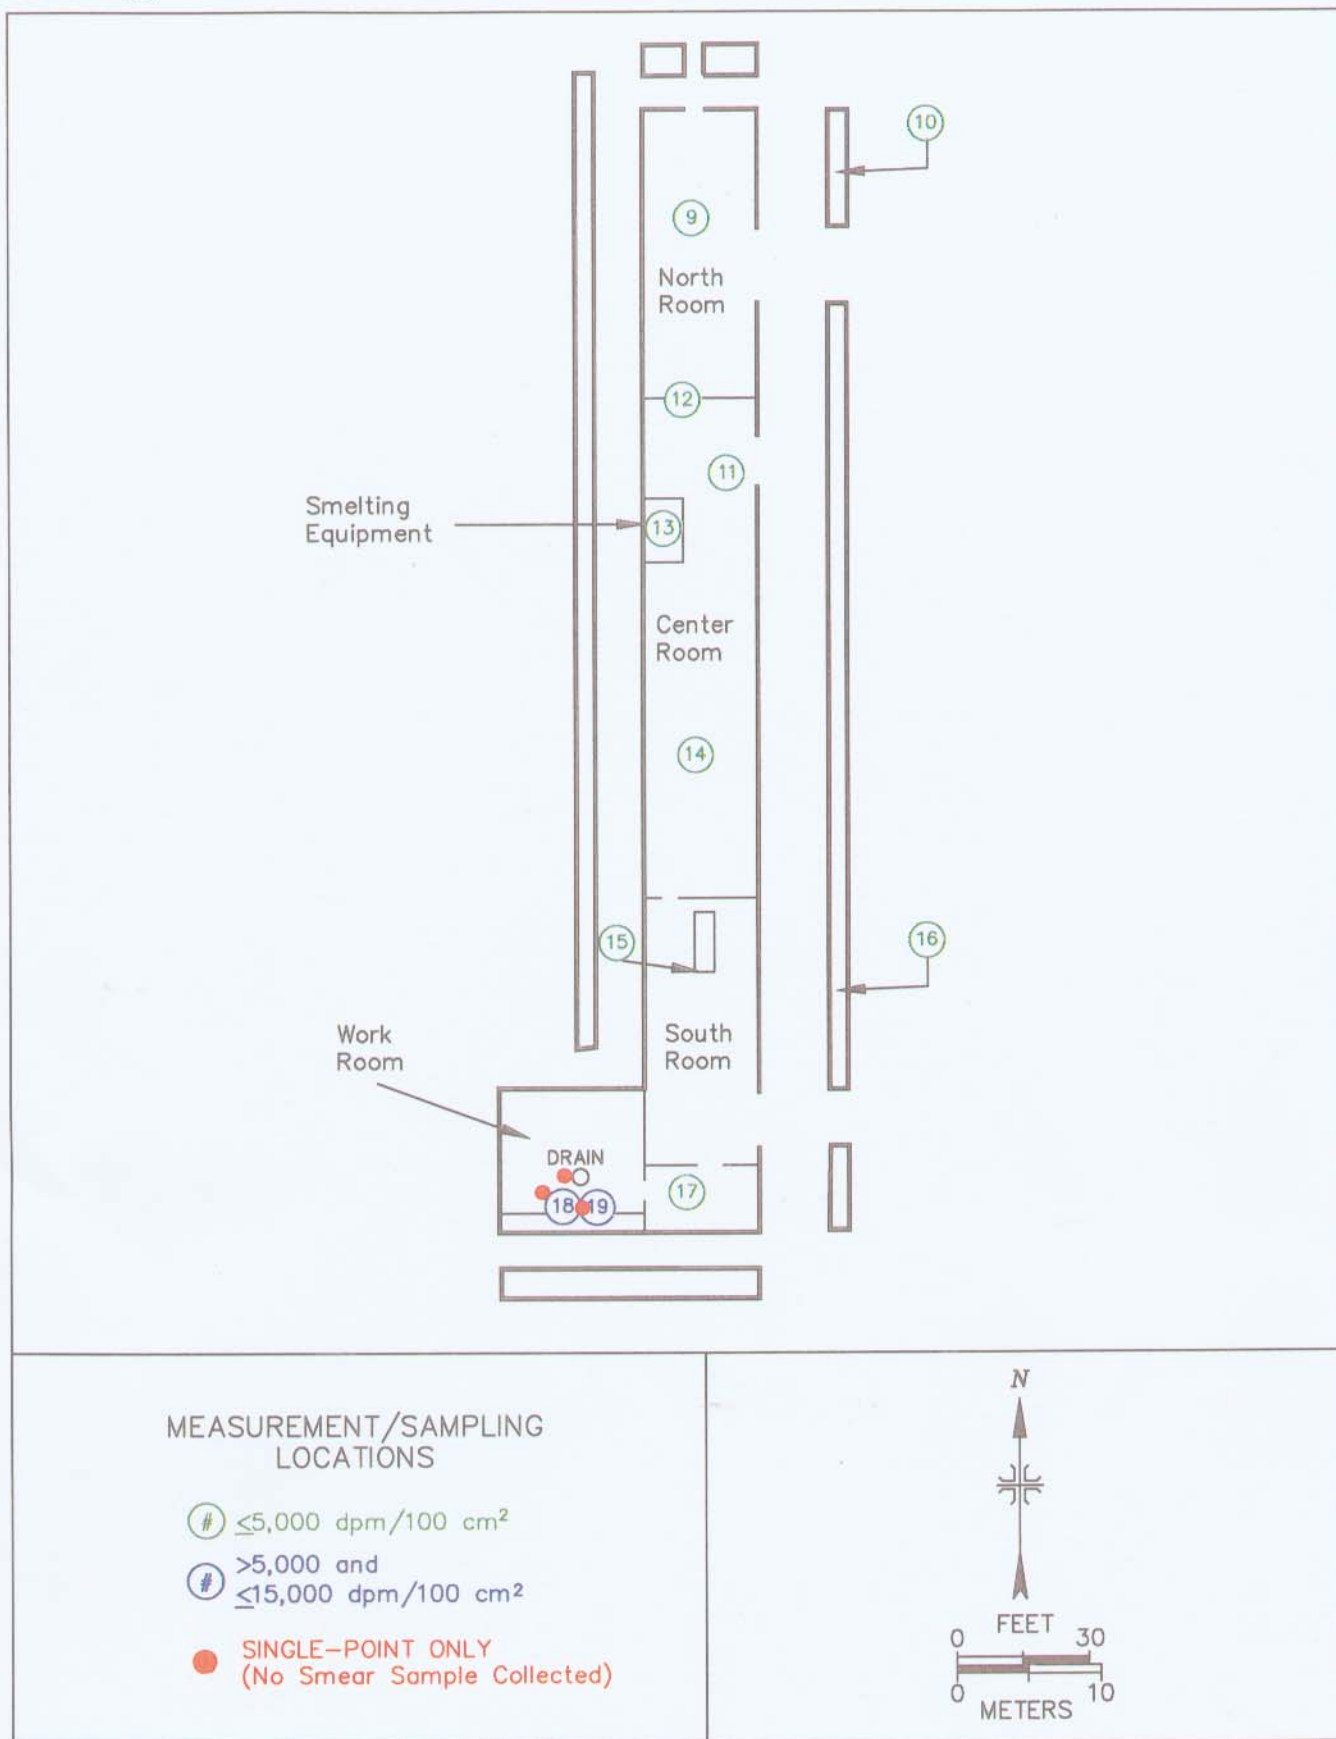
Building 1, Floors, Lower Walls, and Equipment – Direct Measurement and Sampling Locations
